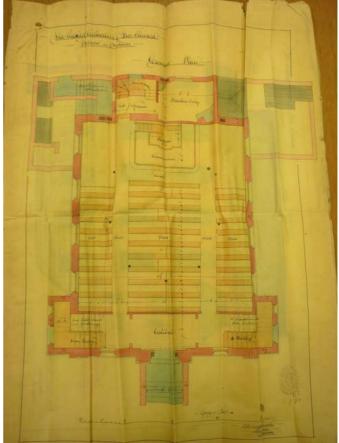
(left): Proposed basement plan (CRO(B) Building Control 998 1875)
